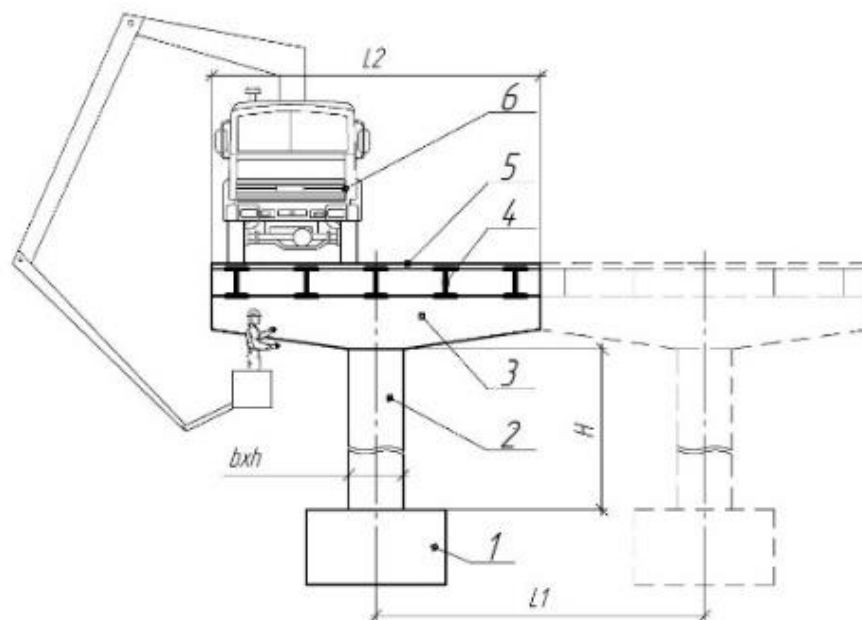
Typical scheme of examination of bridge structures: 1 – foundation block; 2 – bridge support; 3 – cross beam of the bridge; 4 – longitudinal beam of the bridge; 5 – road plate; 6 – installation with a platform for repairing bridges
